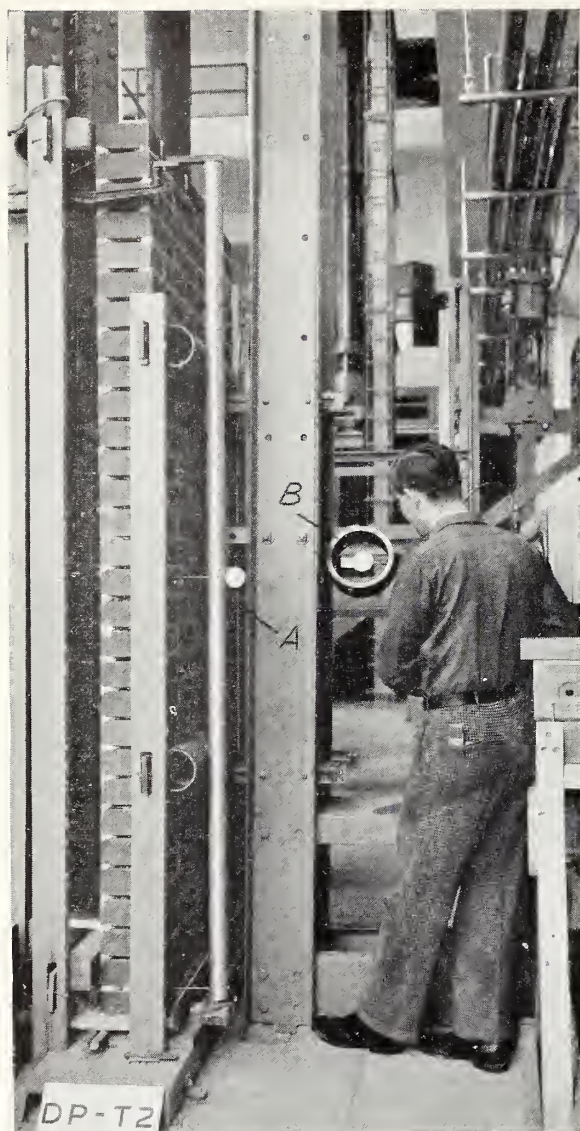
Wall specimen *DP-T2* under transverse load.
